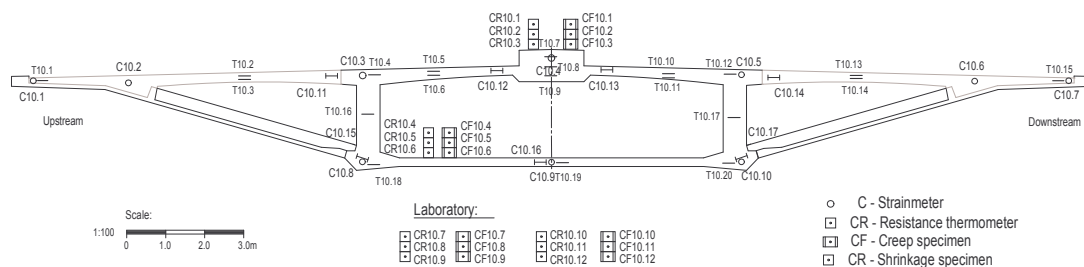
Cross section of the Salgueiro Maia cable-stayed bridge (S10)
